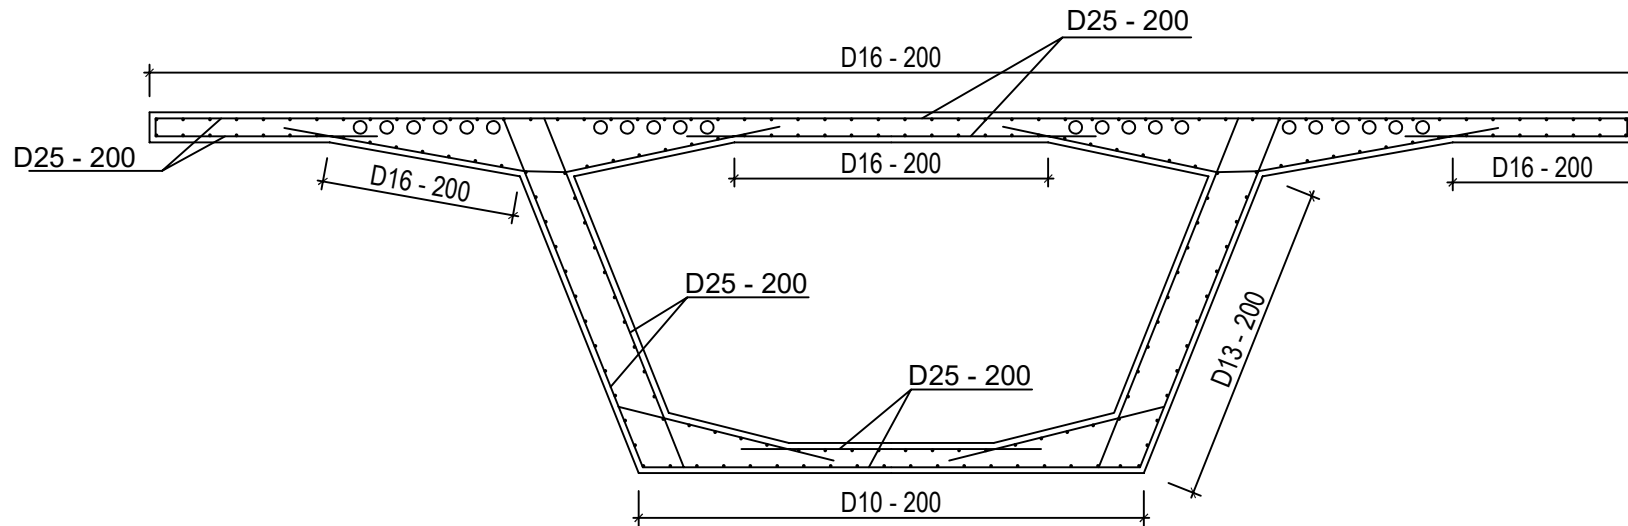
DETAIL BOX GIRDER SEGMENT 9 & 9L (S9 & S9L)
